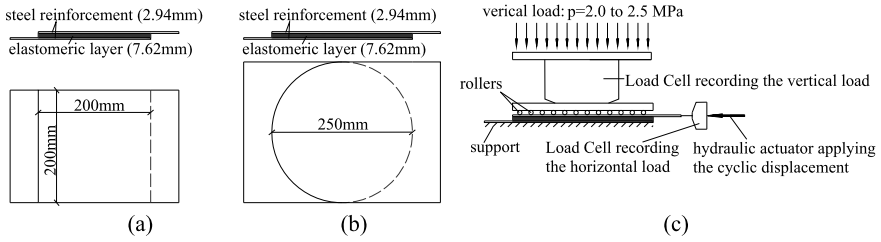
Cross sections and plan views of: (a) rectangular specimens ($200 \times 200 \times 13.5$ (7.62) mm) and (b) cylindrical specimens ($\varnothing 250 \times 13.5$ (7.62) mm), (c) testing arrangement
